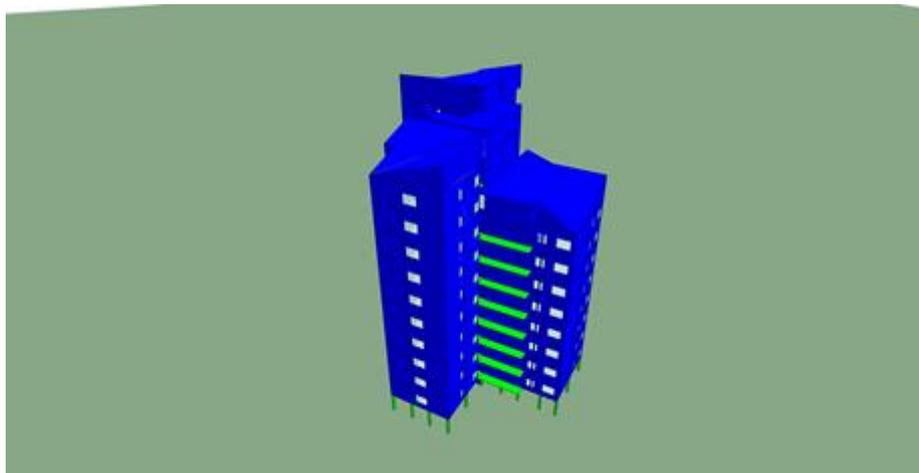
The layout of prefabricated façade modules in the virtual demo building in Milan (Source: TUM)
